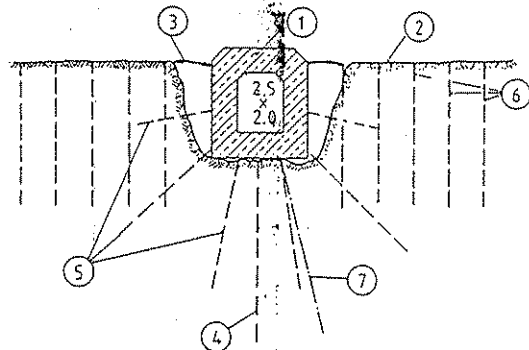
Arrangement of inspection gallery and foundation grouting.
